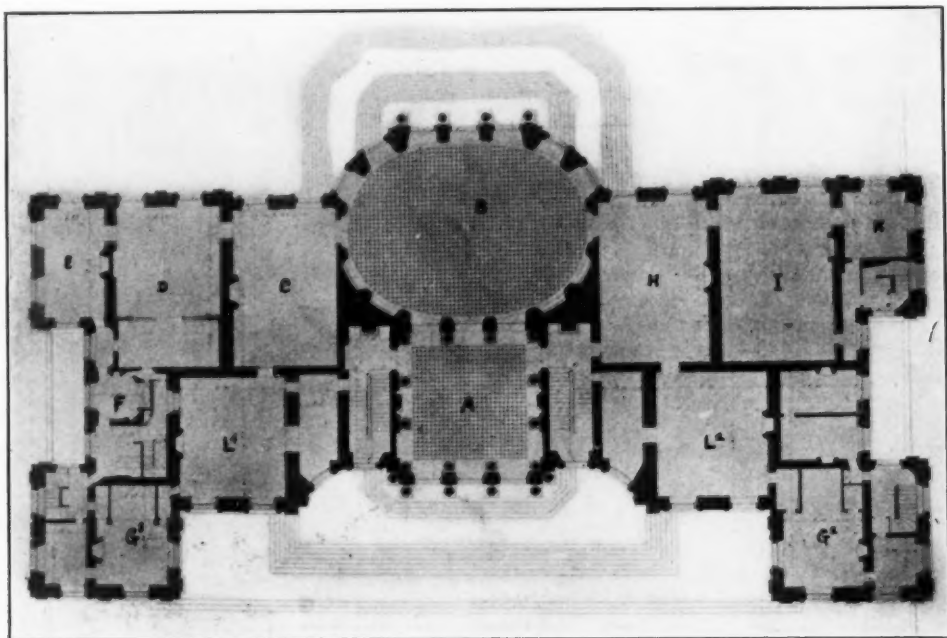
PLAN OF THE GROUND FLOOR OF THE CHATEAU OF VAUX.
